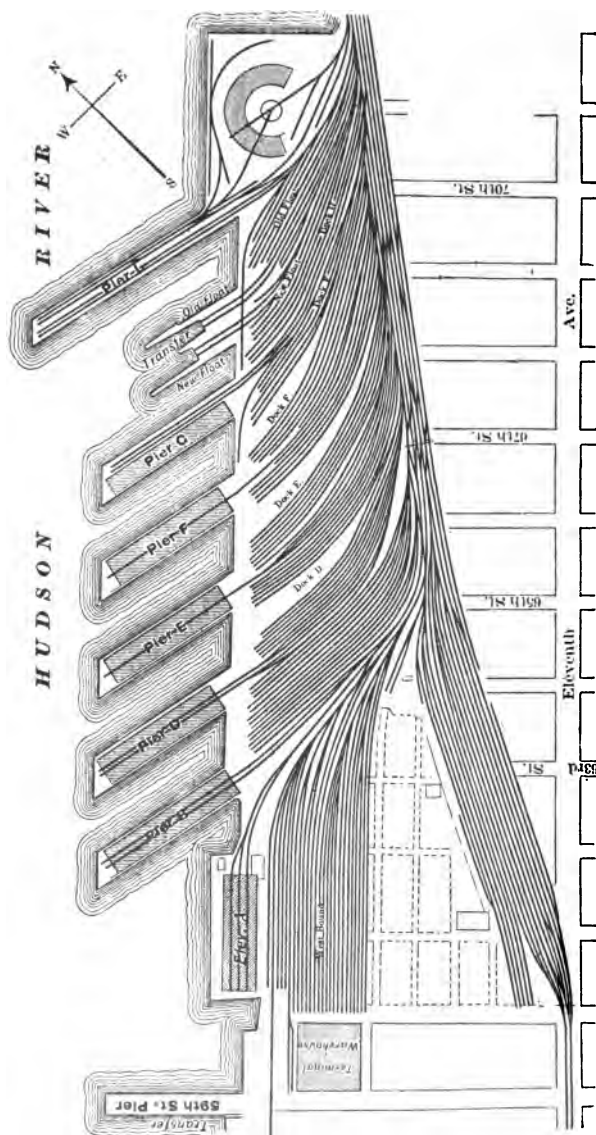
Plan of New York Central Yards and Piers at 69th Street, New York City.
